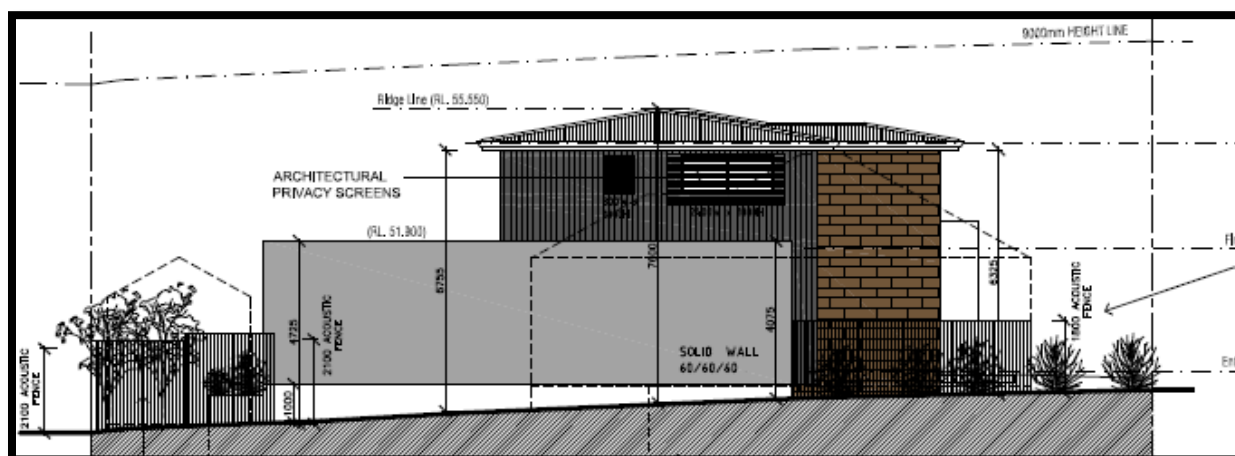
South east (side) Elevation at 49 Jersey Avenue Mortdale (Source – NDGroup Architects)
